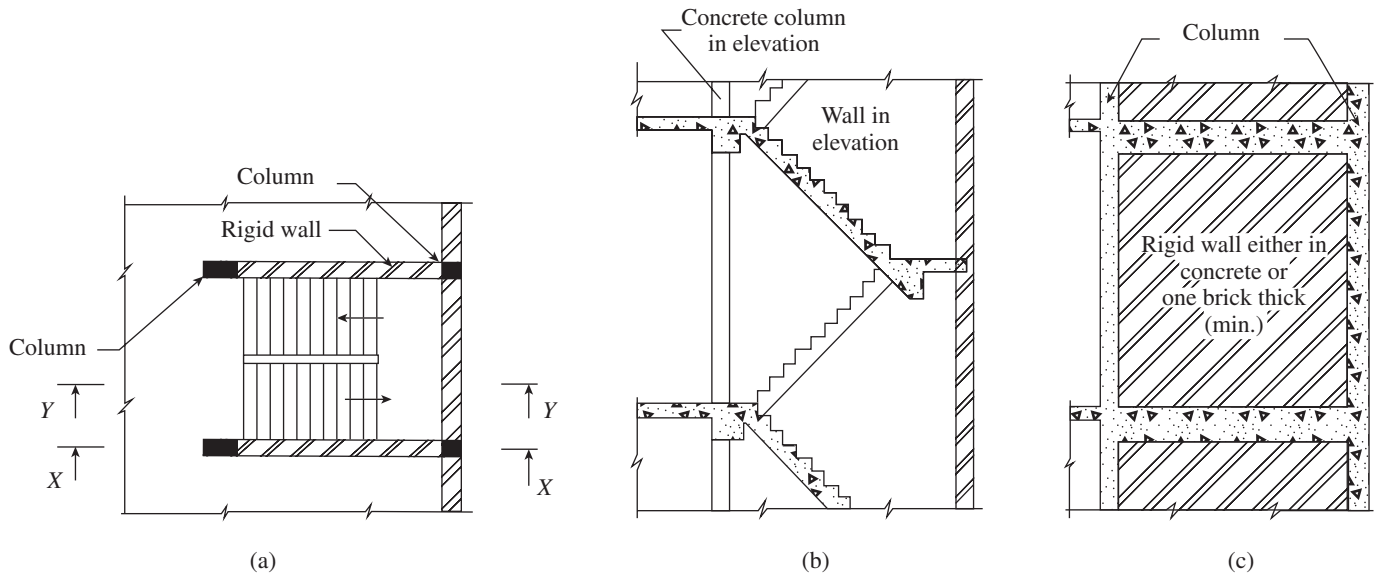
Rigidly built-in staircase (a) Plan (b) Section Y–Y (c) Section at X–X
